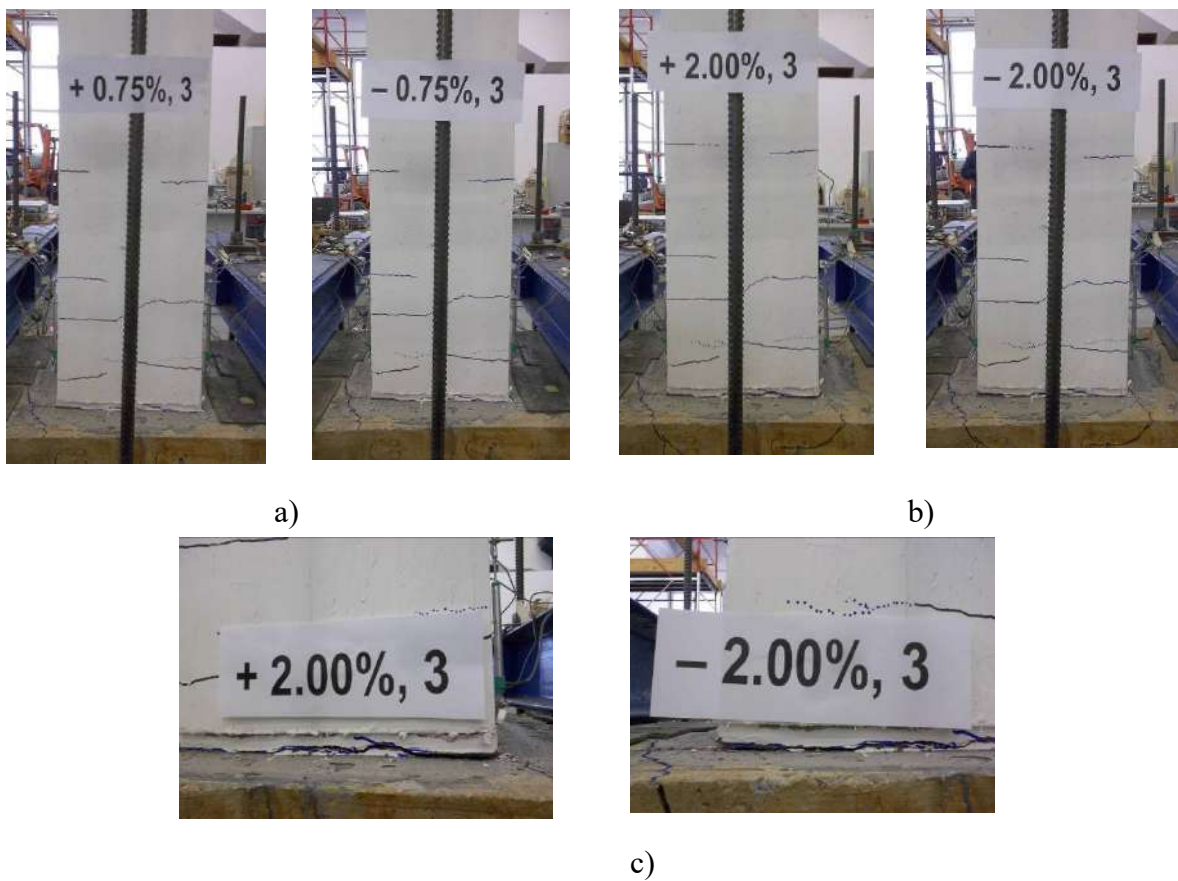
Corroded Reinforced column (CR): Crack pattern at a drift of 0.75% (a) and 2% (b, c)
